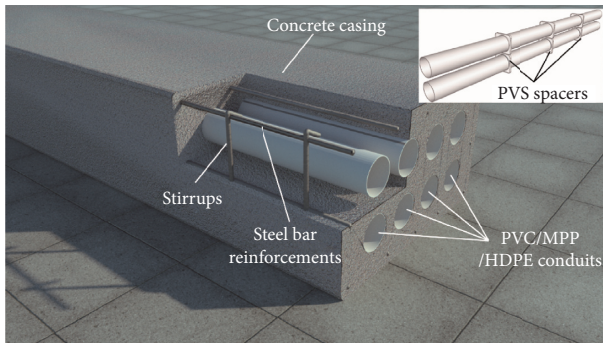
Sketch of concrete-encased underground electrical duct bank.
